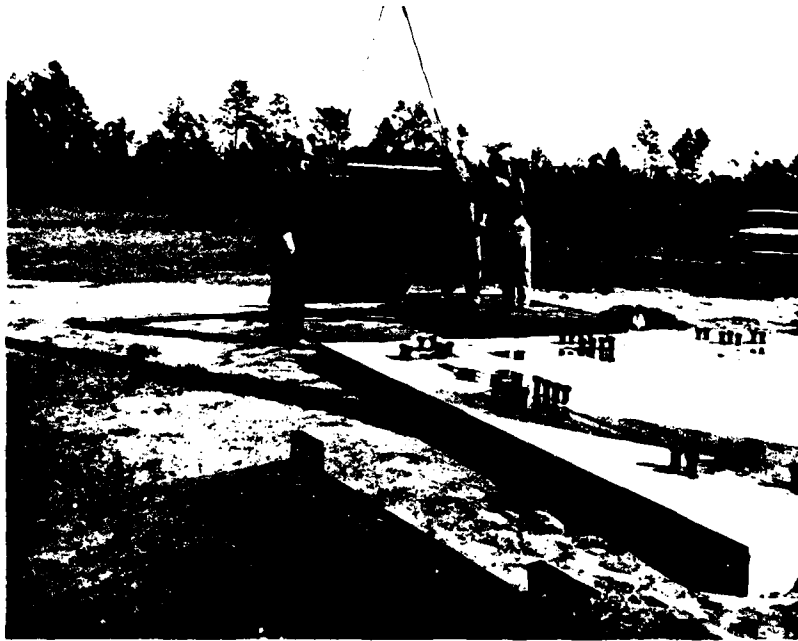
Category 5 Suppressive Shield Wall Section Being Positioned on Concrete Slab
